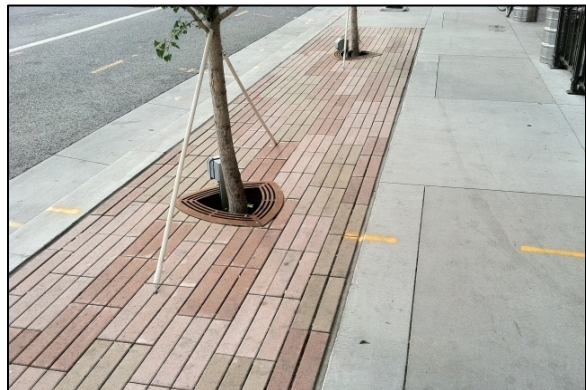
Porous pavers in downtown Denver allow storm water infiltration into tree planting areas.
